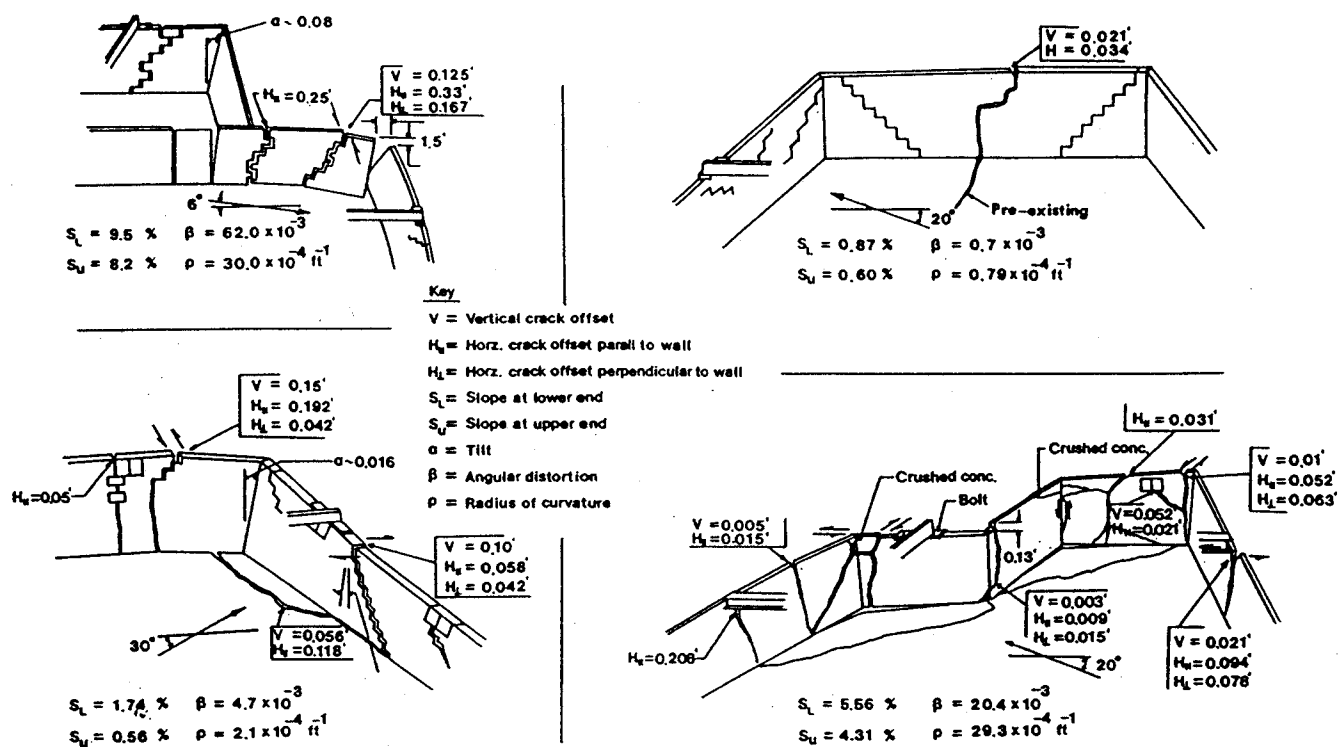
Isometric views of major damage to masonry and concrete bearing walls in the tension zone (Marino and Mahar, 1984).
